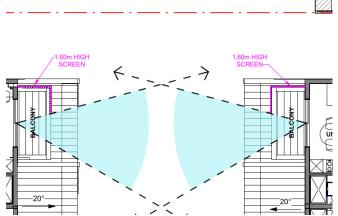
Second floor area of concern in relation to visual privacy to the adjoining unit
